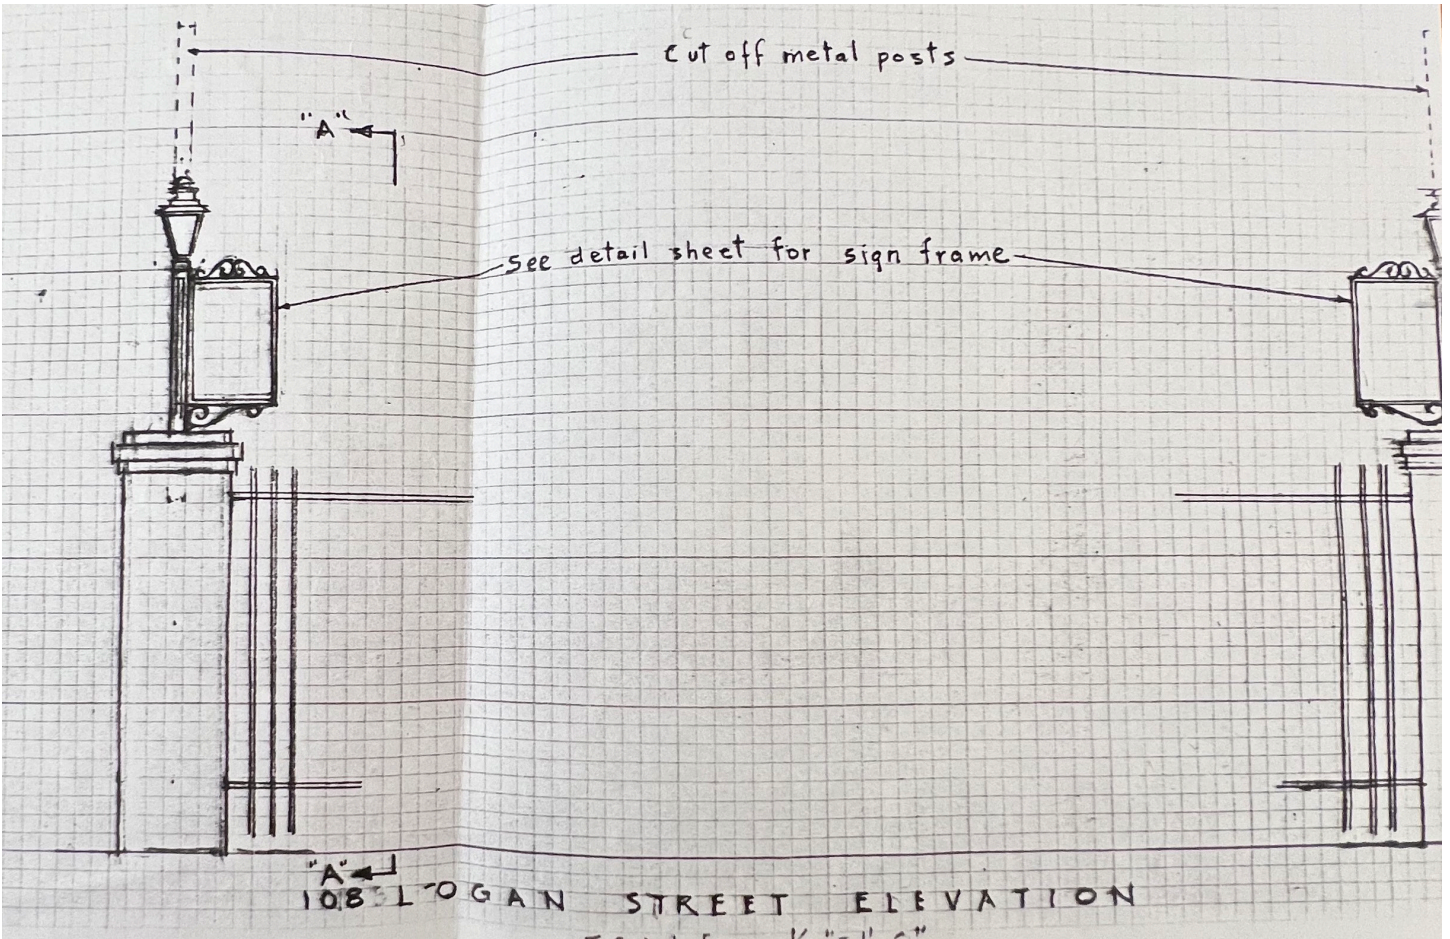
1993 plans for sign and lamp installation at No. 108 Logan Street (Board of Architectural Review)
